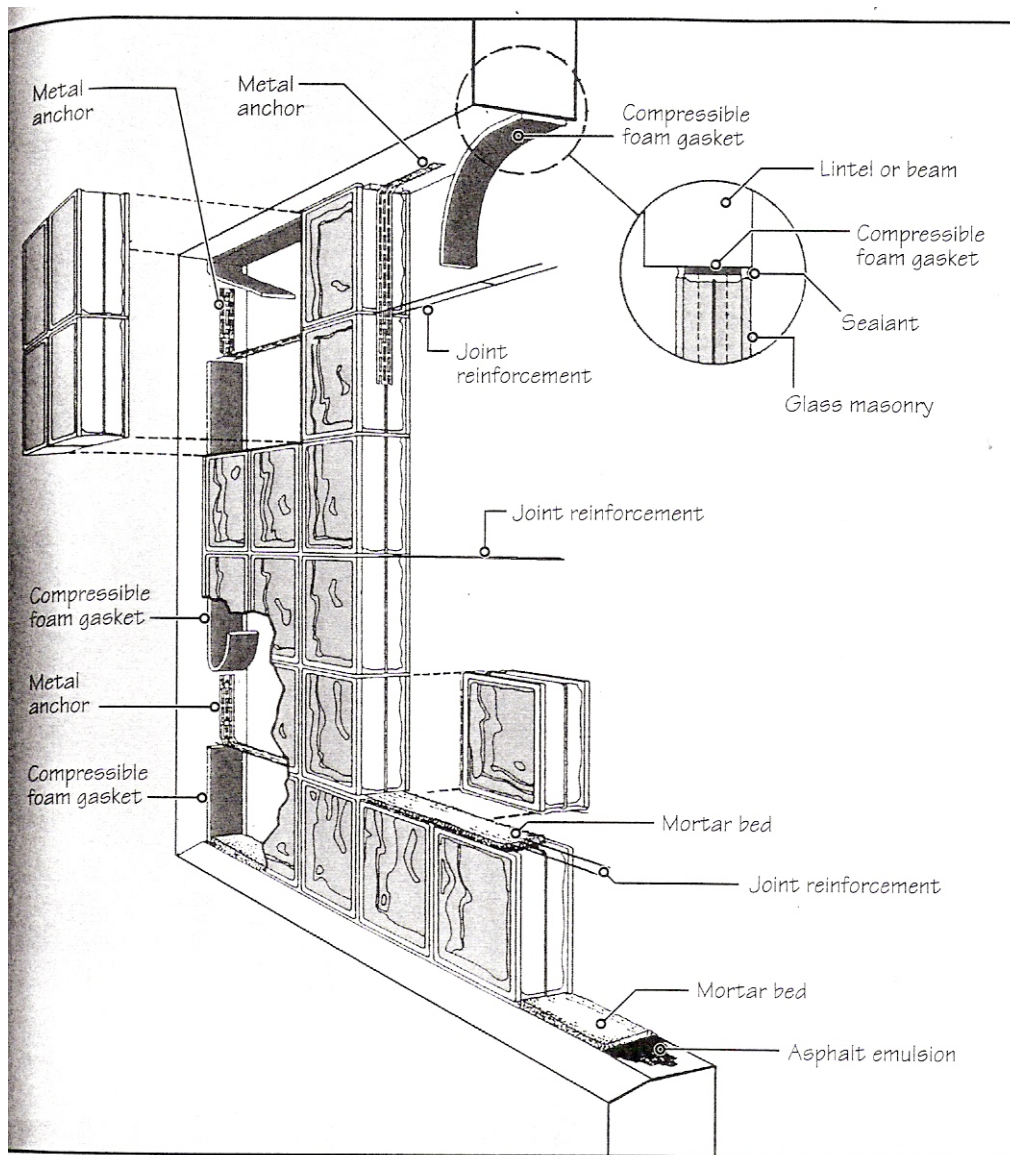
A typical detail used for the construction of a glass masonry panel.
